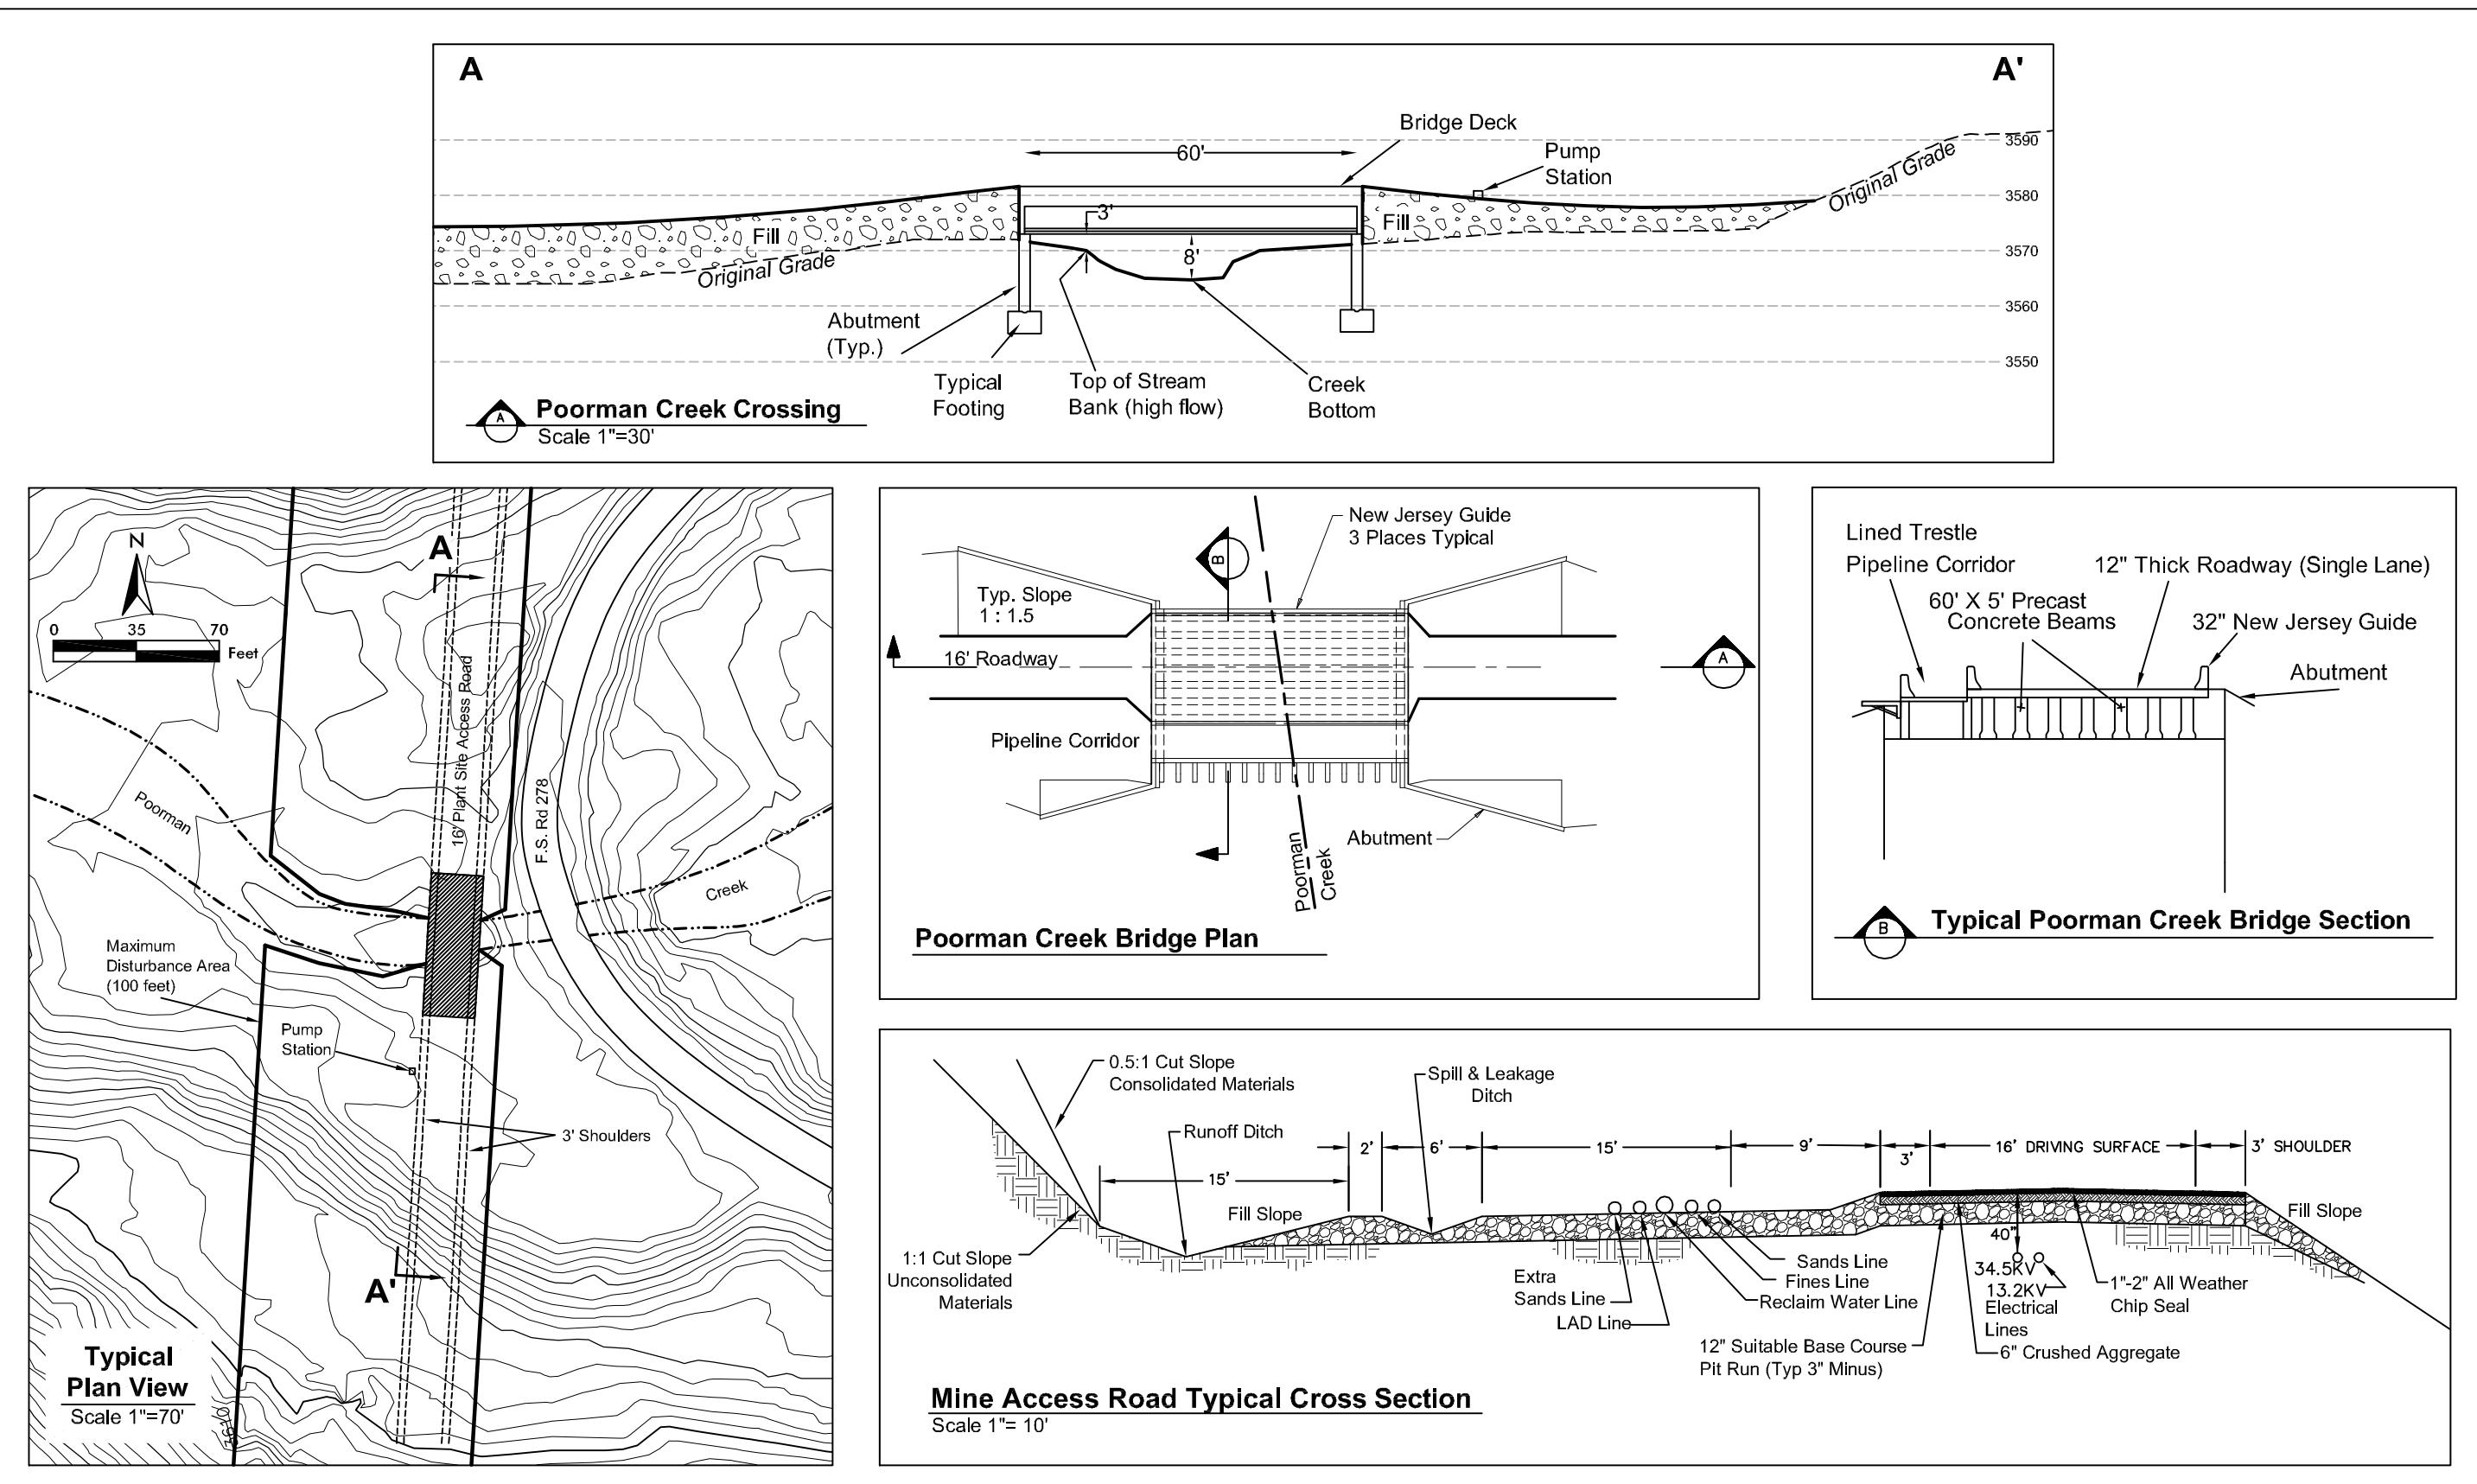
Details of Tailings Pipelines, Utility, and Access Road Corridor, Alternative 3
